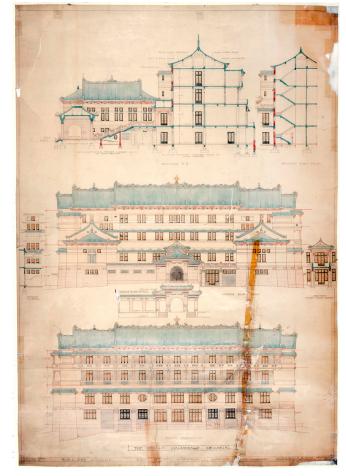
Plans for Gerald MacDonald Memorial in Stanley drawn by Little, Adams and Wood in November, 1932. Plans show North Elevation and South Elevation, Front Entrance Gate and Sections. (Source: Maryknoll Mission Archives New York).
